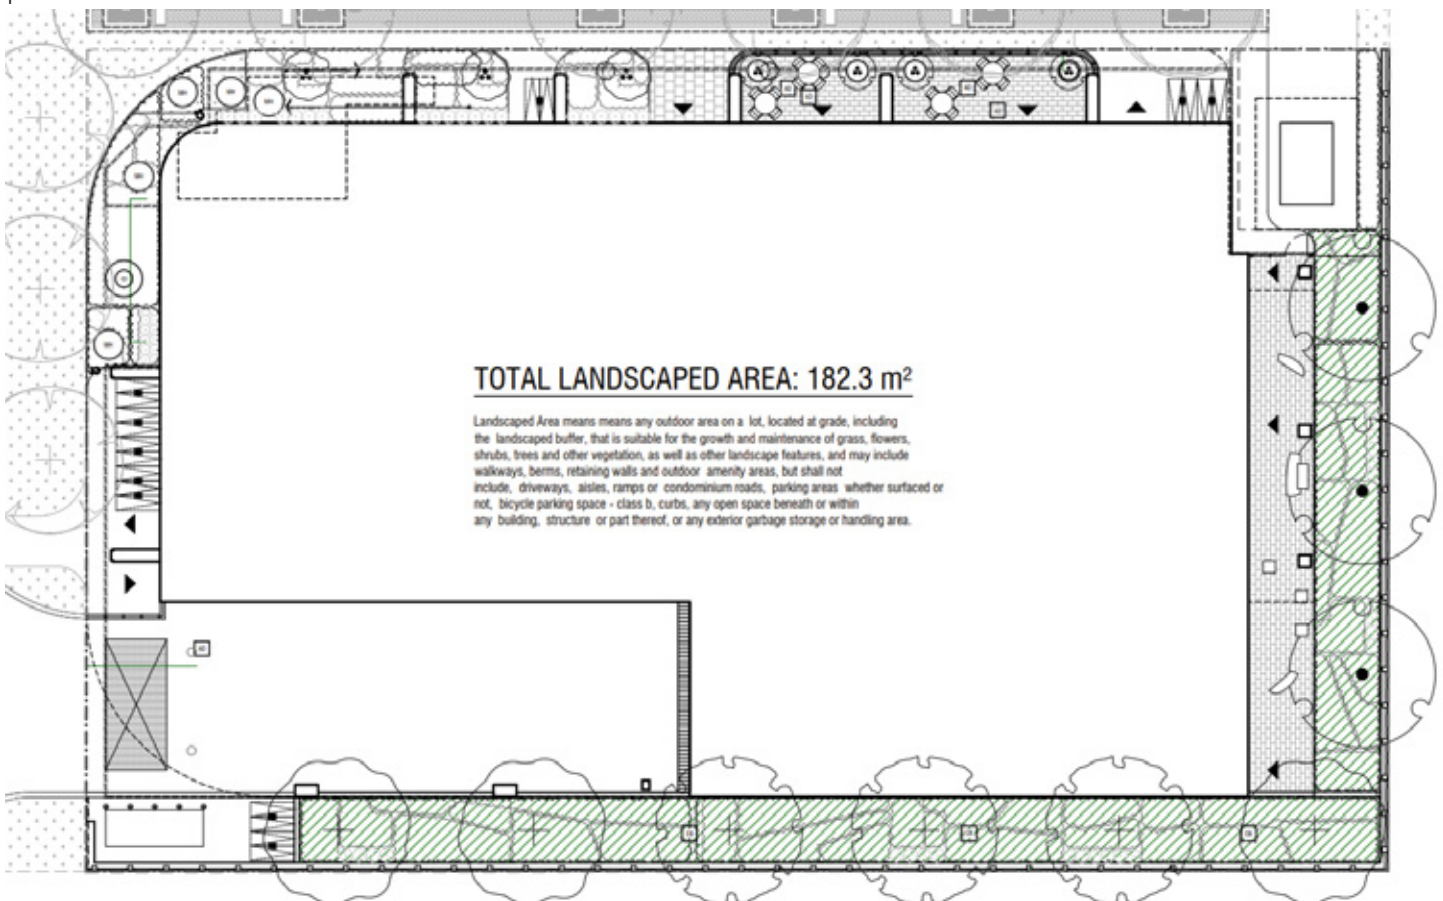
Landscape area - key plan (Source: Land Art Design)
